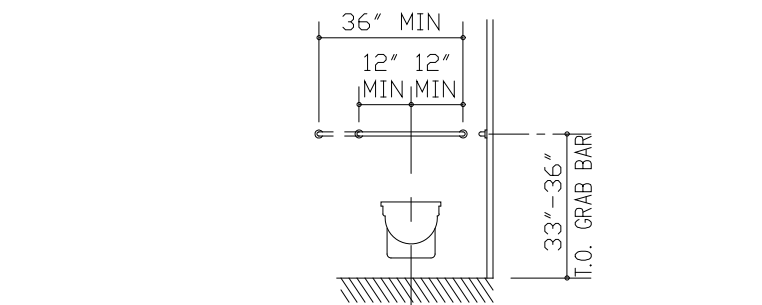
REAR WALL OF STANDARD TOILET STALL
